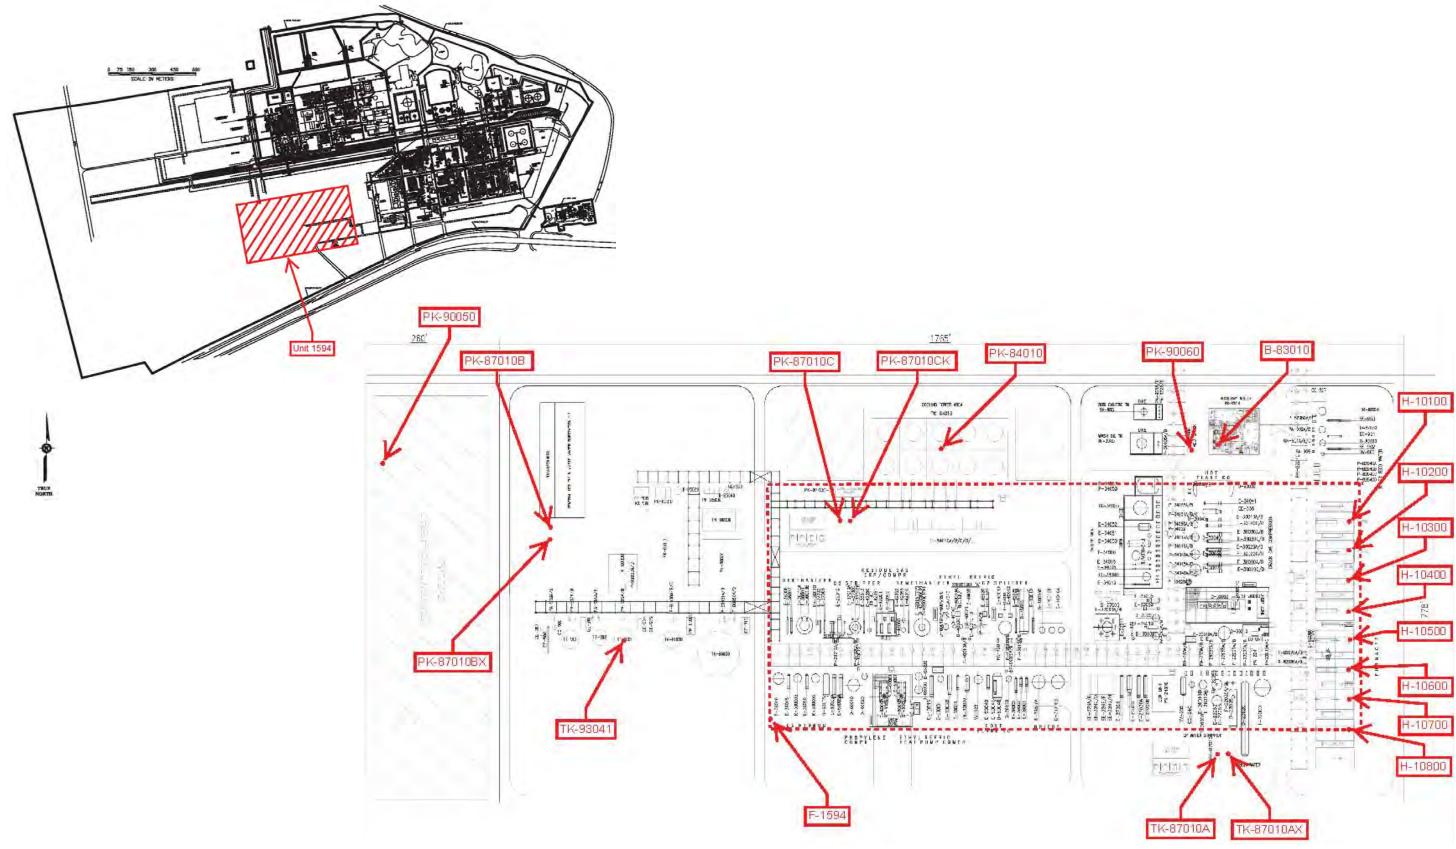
Proposed site plan for the Cedar Bayou Plant.
